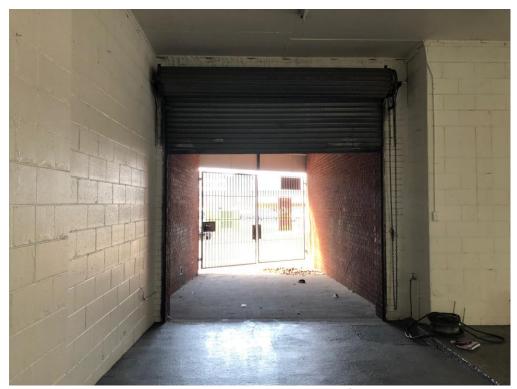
Looking through concrete driveway to Rowe Street from inside tenancy
